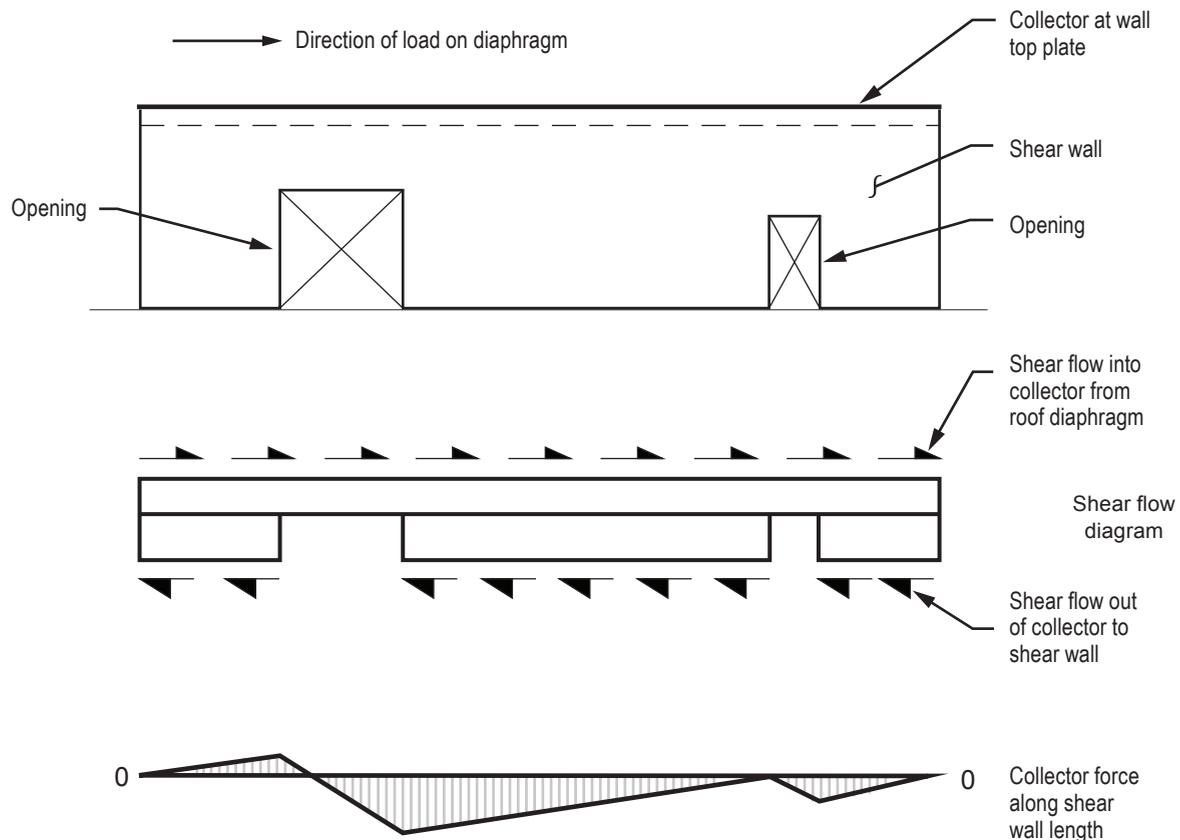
Wall top plate acting as collector boundary element. The diagram below the wall shows the variation in collector force along the collector length.
